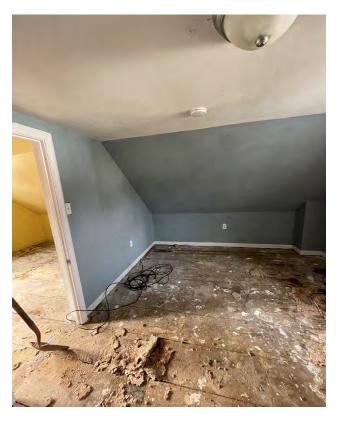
North upstairs bedroom, providing a view into the south bedroom through the doorway, and of the wall separating the two rooms. The original wood flooring is also visible.
